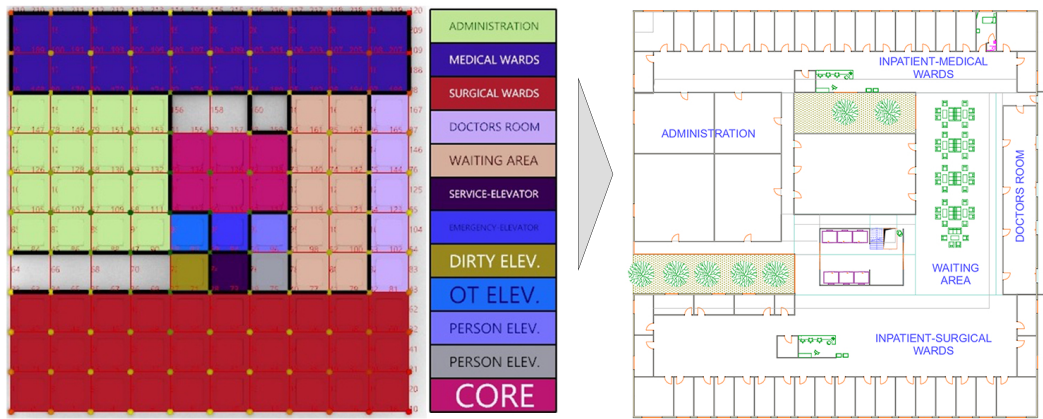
Second-floor plans (left: output of the tool, right: technical plans)
